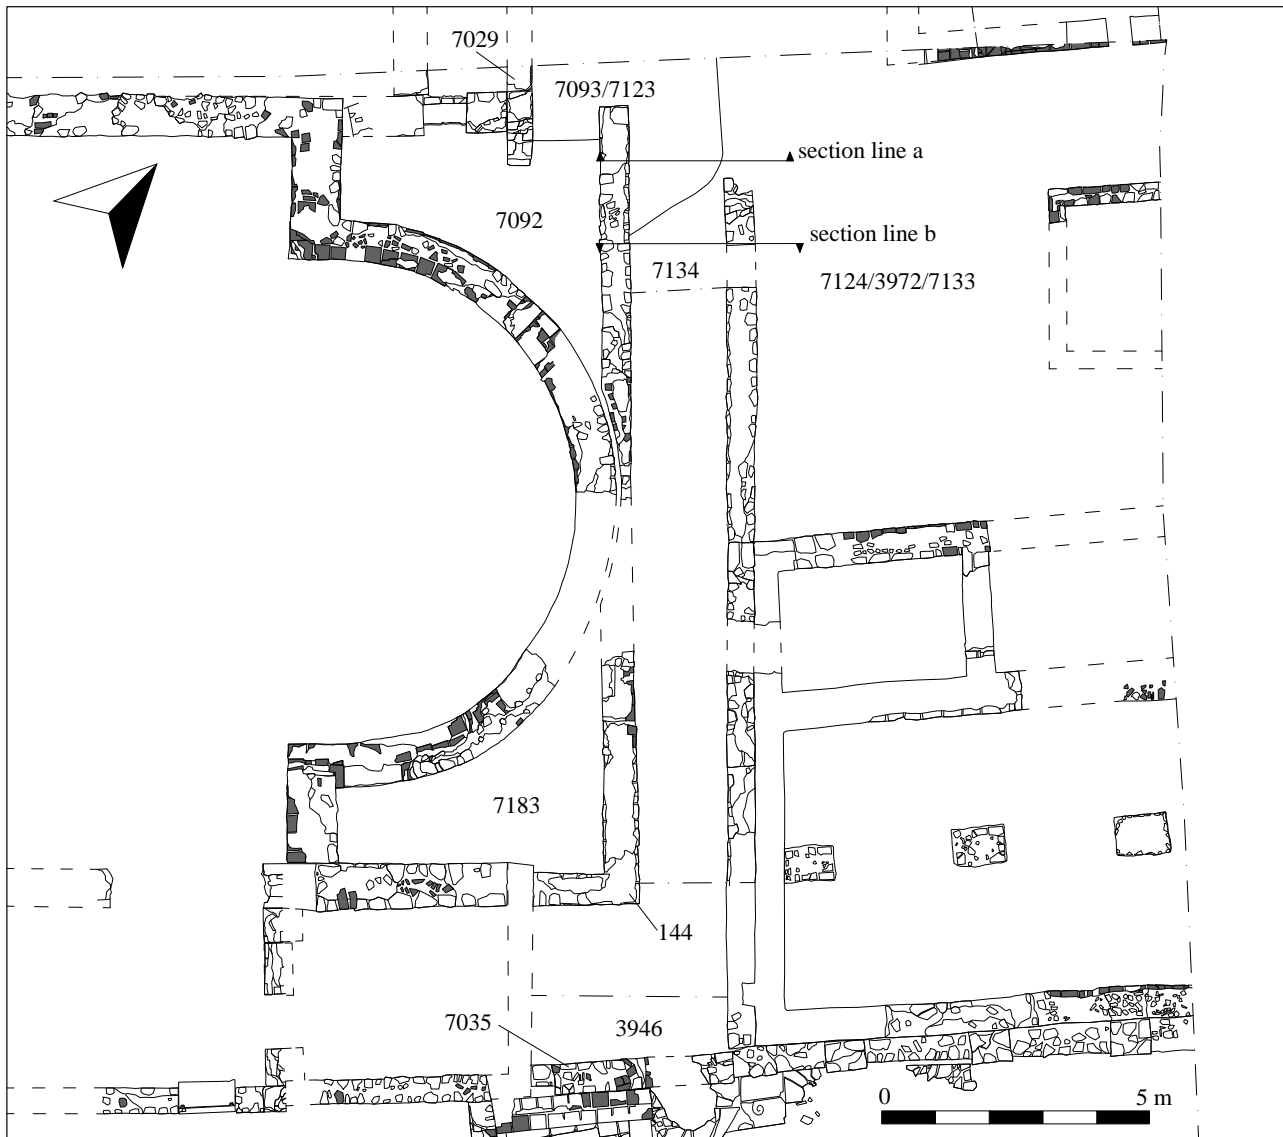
Plan of the Phase 3b alterations made to the apse of the apsidal hall and the area to the east of it
